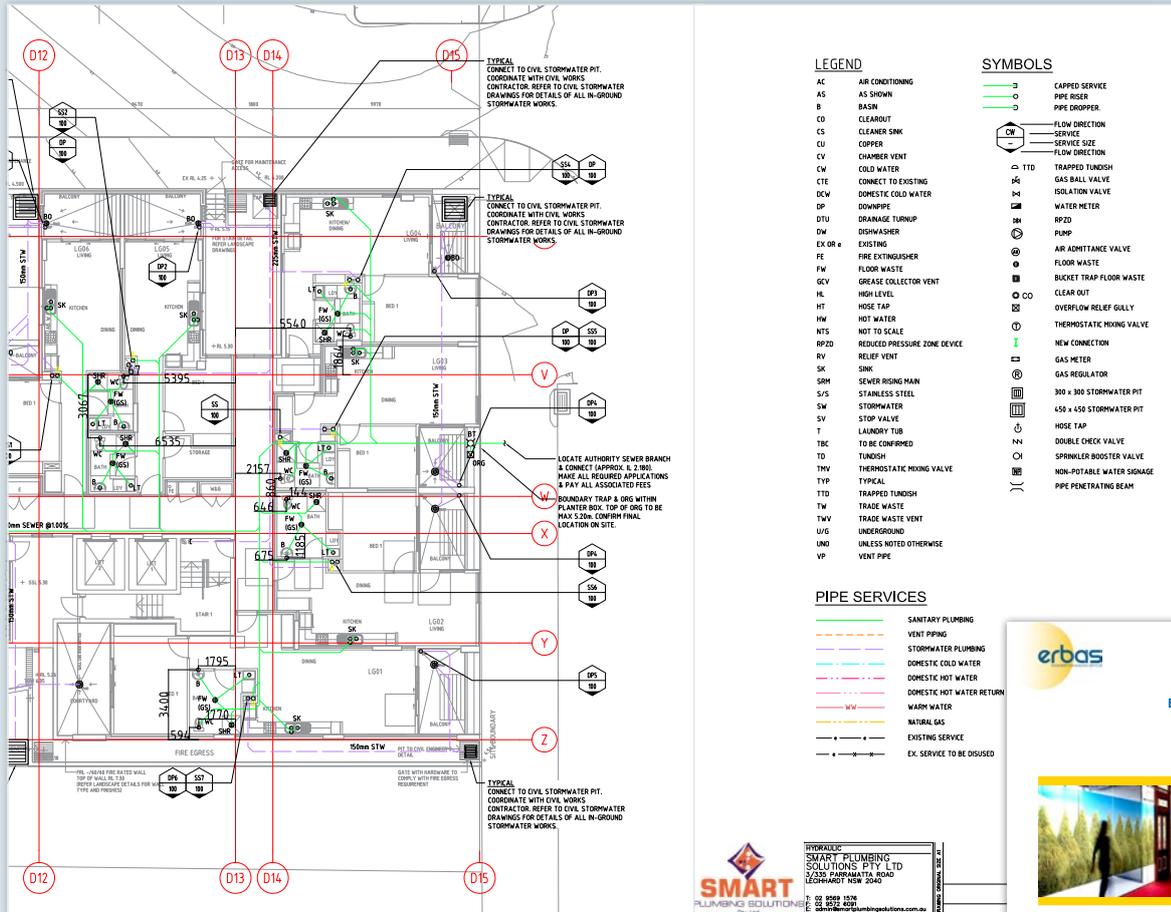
Partial hydraulic floor plan, schedule and specification for Elger Street, Glebe, Sydney
